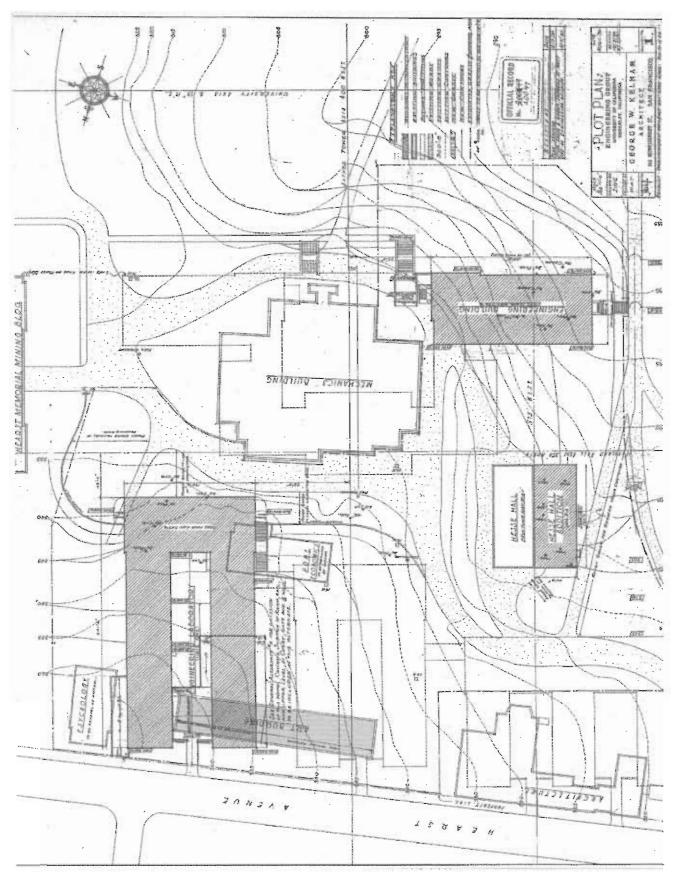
Plot Plan: Engineering Group (George W. Kelham, 1930) Capital Projects, Plan Room, UC Berkeley
